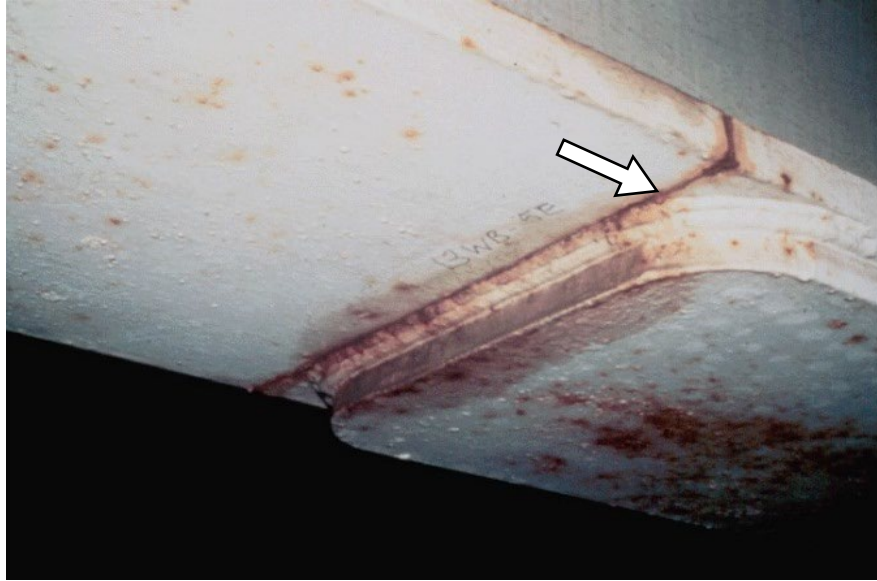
Through Crack at a Cover Plated Flange
